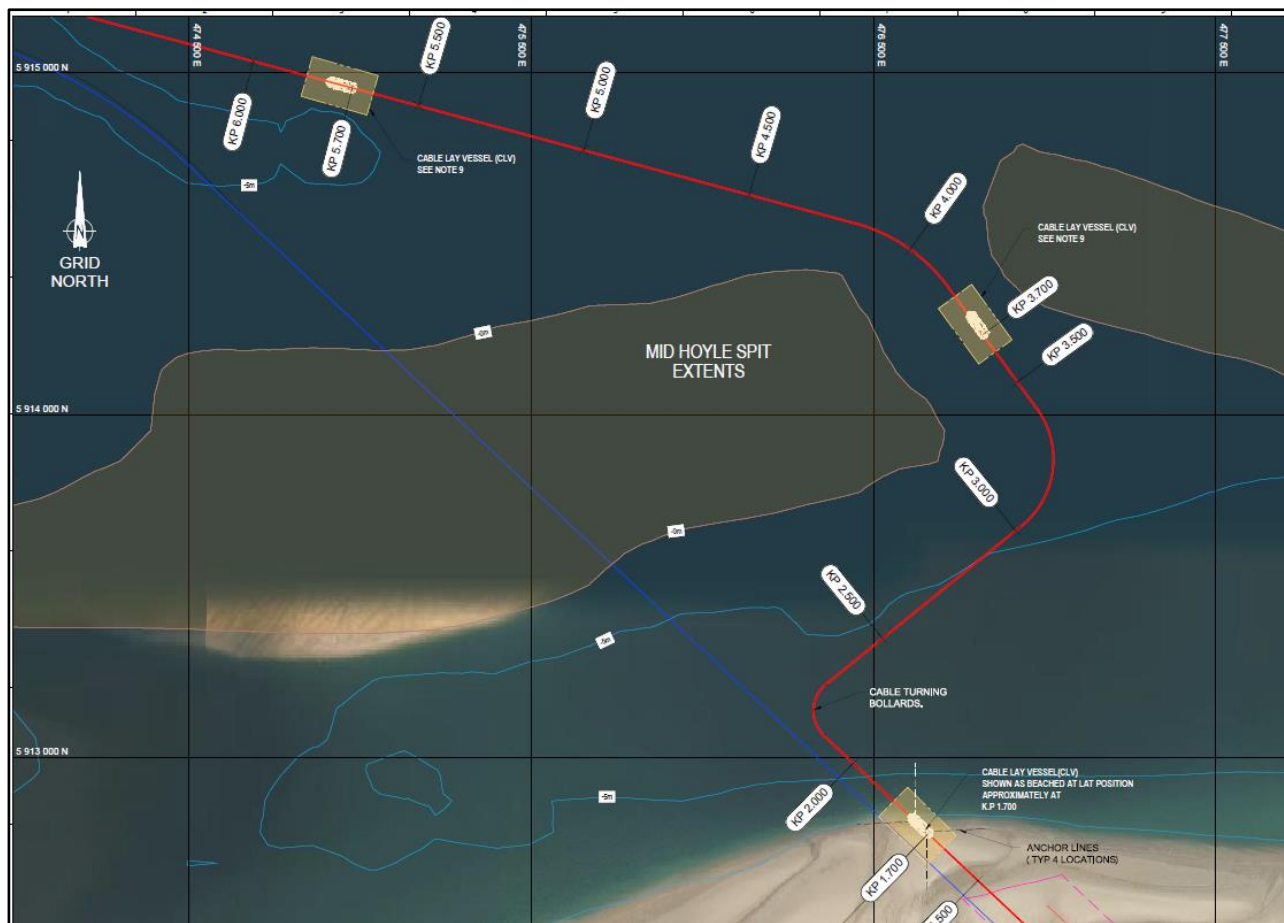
Cable Route Option To East Of West Hoyle Bank
